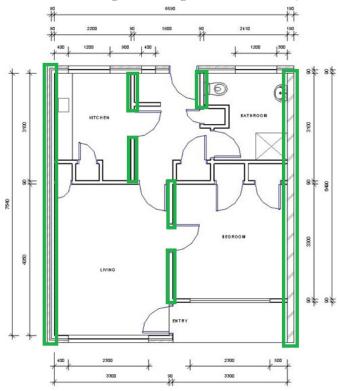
Walls used for bracing in the transverse direction, Blocks A-C.
